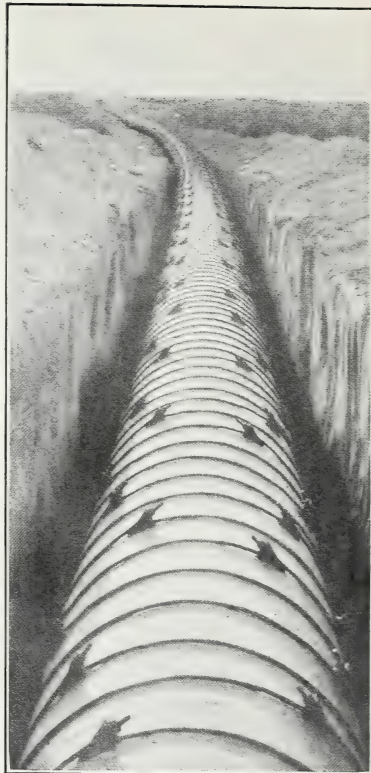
MAIN LINE, PASCO RECLAMATION CO., WASHINGTON (No. 37). TYPICAL ALIGNMENT AND PROFILE.
